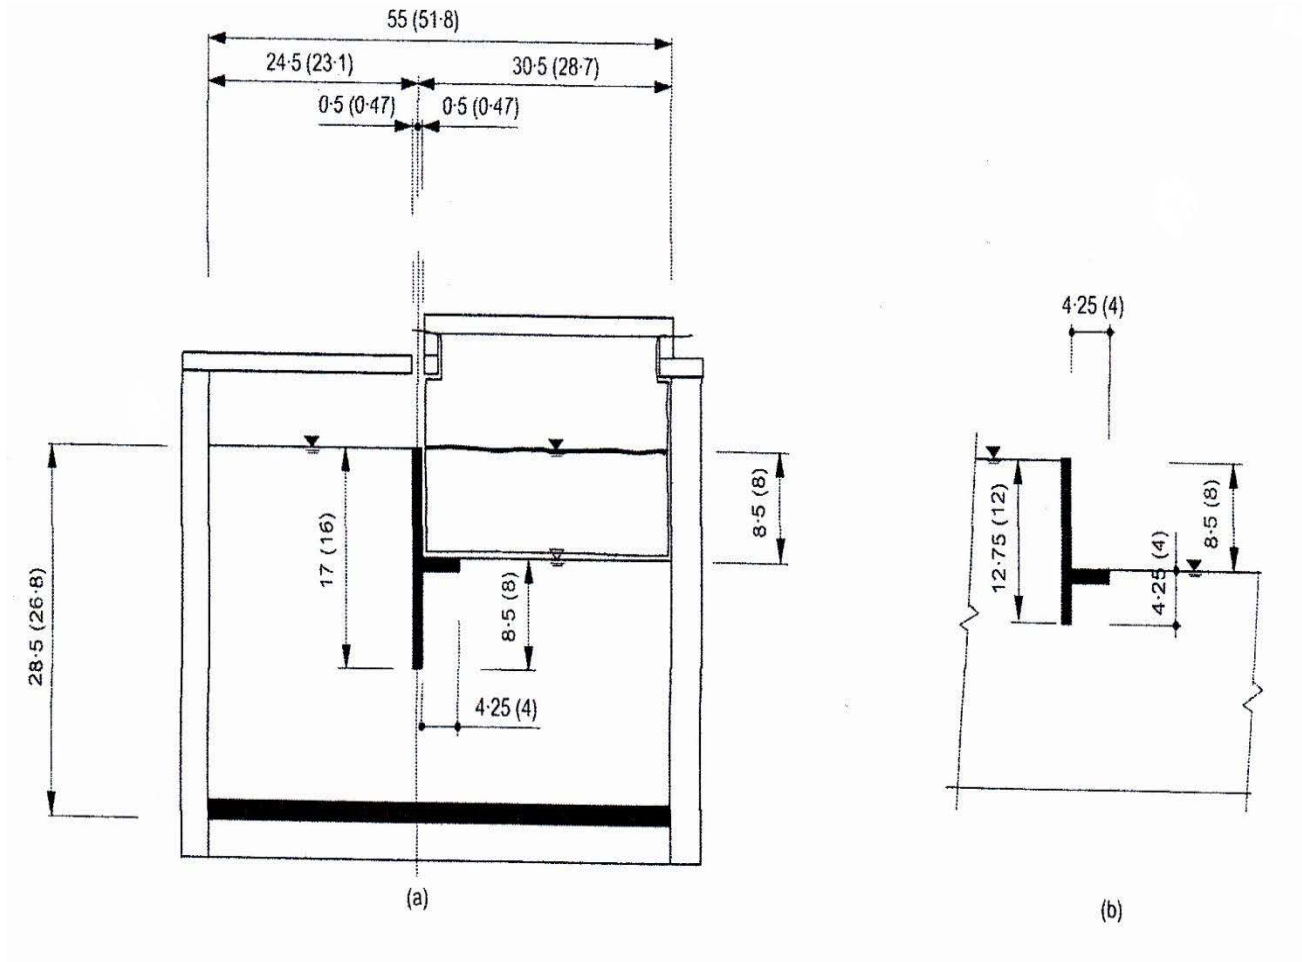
Schematic cross section of a retaining wall with a stabilising platform (after Powrie et al. 2007)
